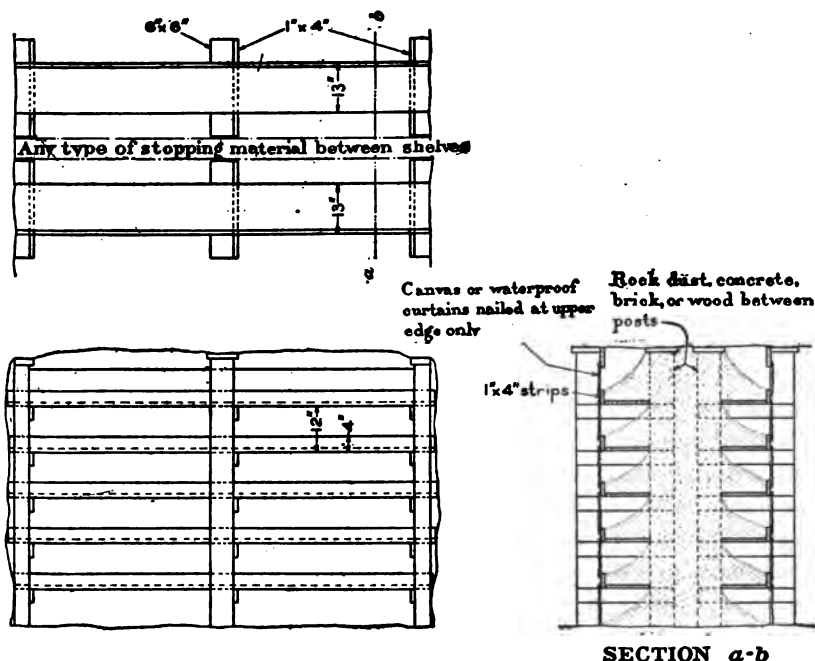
shows a plan of the shelves on both sides of a stopping, a front elevation, and a vertical transverse section showing the sets of shelves with the space between filled merely with rock dust instead of brick, concrete, or wood, or some other stopping material.
